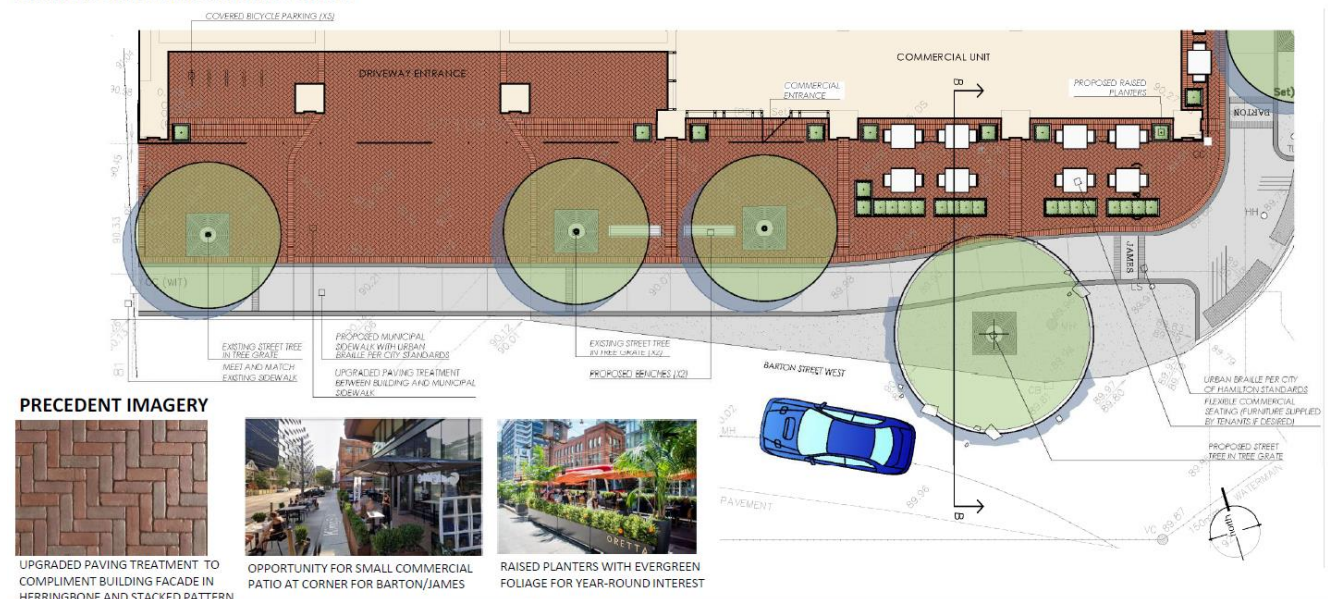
Barton Street West landscape design of proposed development (Lintack Architects 2023)
